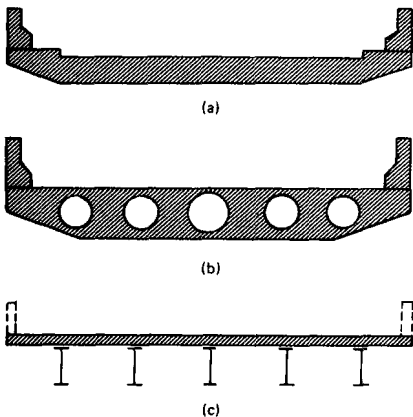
Cross sections of shallow superstructures: (a) a slab bridge; (b) a voided slab bridge; (c) a slab-on-girder bridge.
